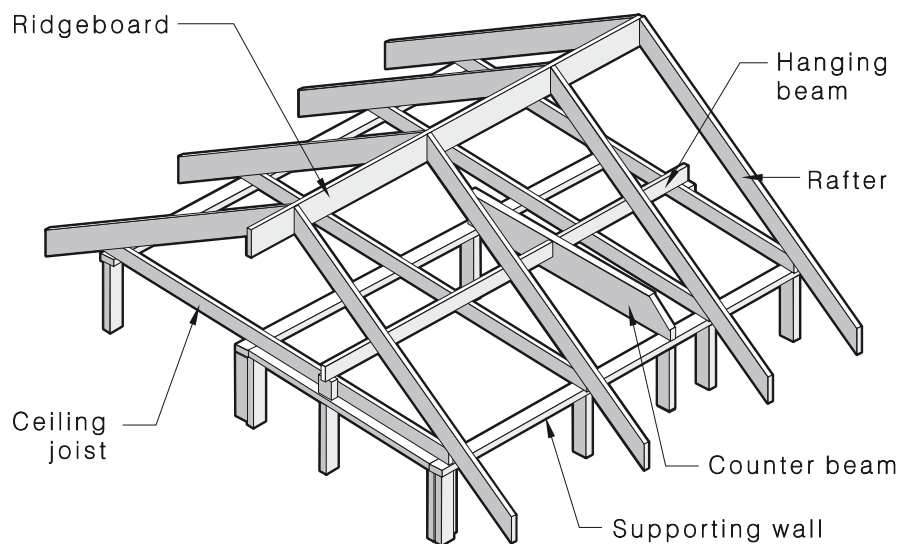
COUNTER BEAM SUPPORTING HANGING BEAMS
